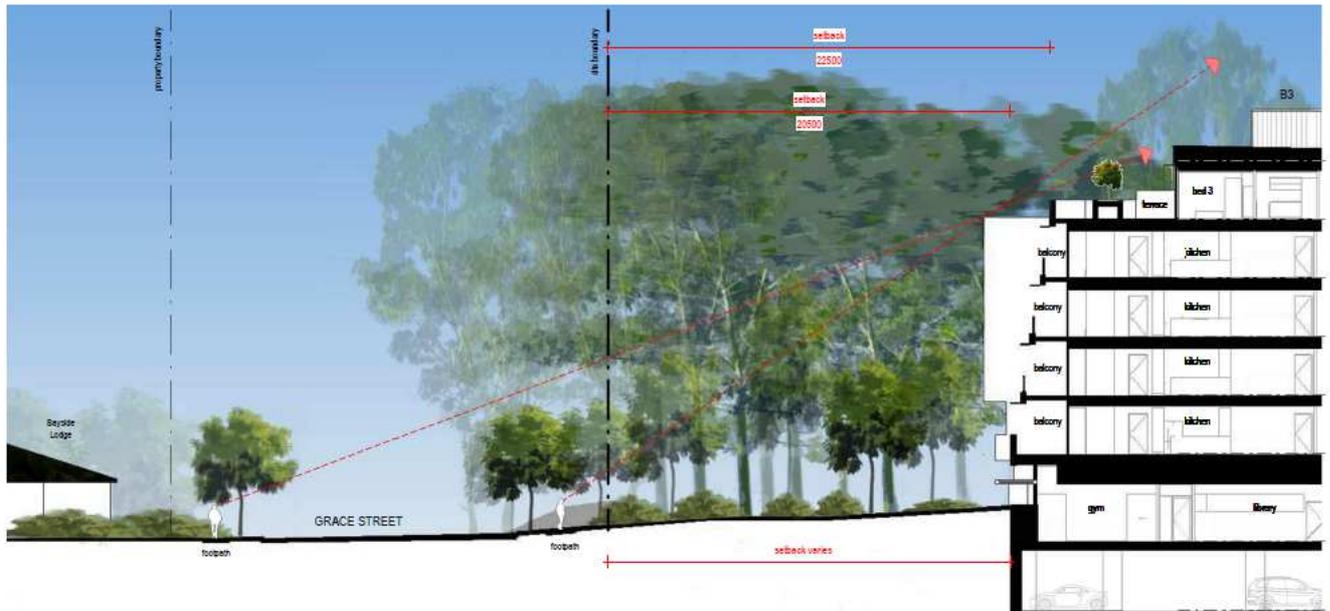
North-Eastern Elevation of Proposed Buildings 3 and 4 (Source: S3 Architects)
